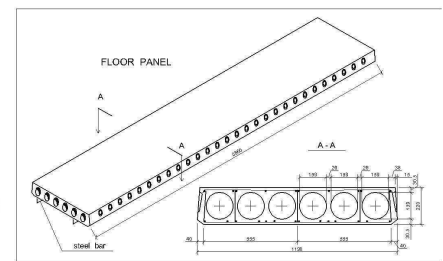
B: Precast Hollow-Core Reinforced Concrete Floor Slab (Source: U. Begaliev and S. Uranova)
